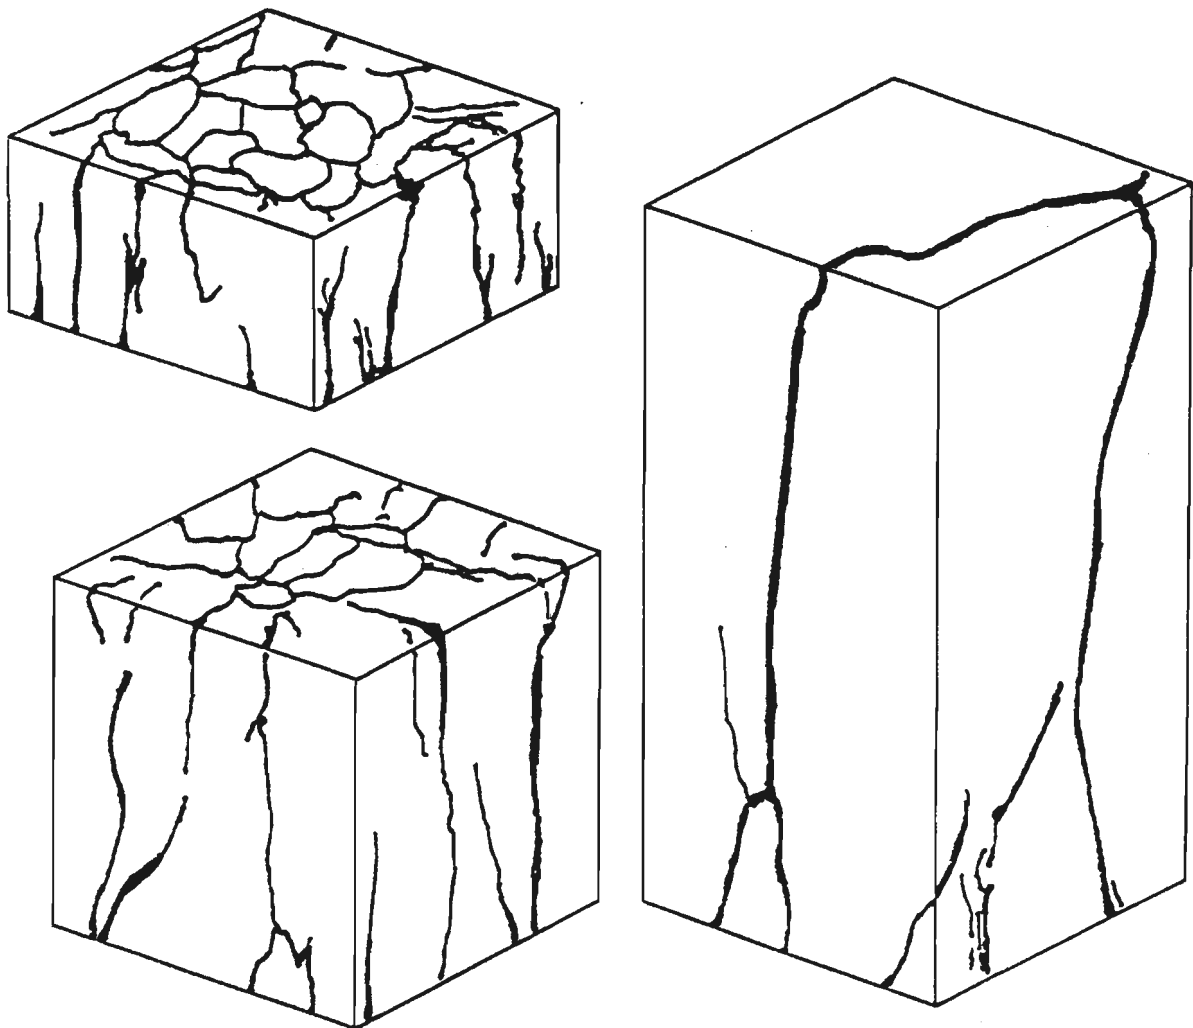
Typical failure modes for normal strength concrete specimens (teflon tests)
